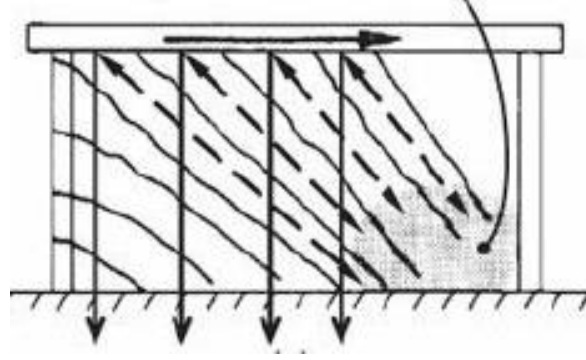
Diagonal compression failure of RC walls (Moehle, 2014)
